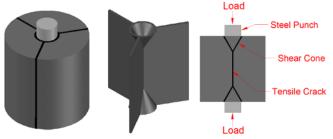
DPT layout and ideal failure mechanism. Isometric view of failed specimen (left), isometric view of failure surface (center), and center cross section of failed specimen (right).
